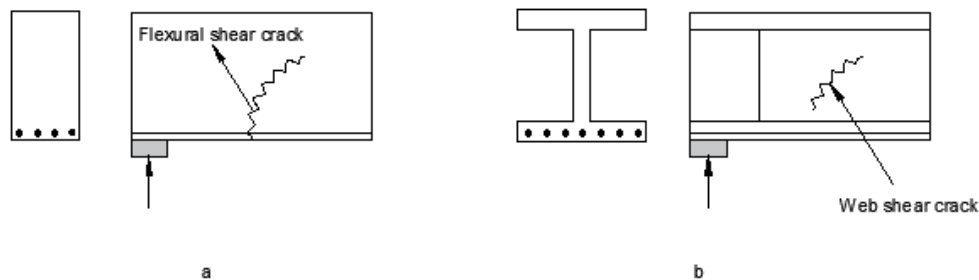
a) Types of cracks in reinforced concrete members: flexural shear and flexural cracks, b) web shear crack. Based on Engström (2011).
